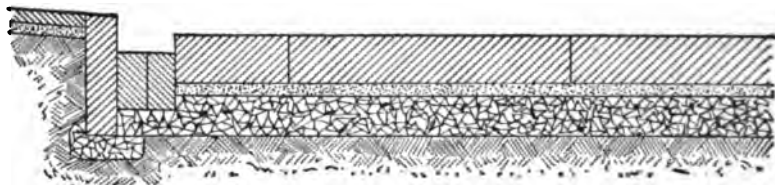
SECTION AT CROSSING, SHOWING GUTTER PAVED WITH STONE BLOCKS.
